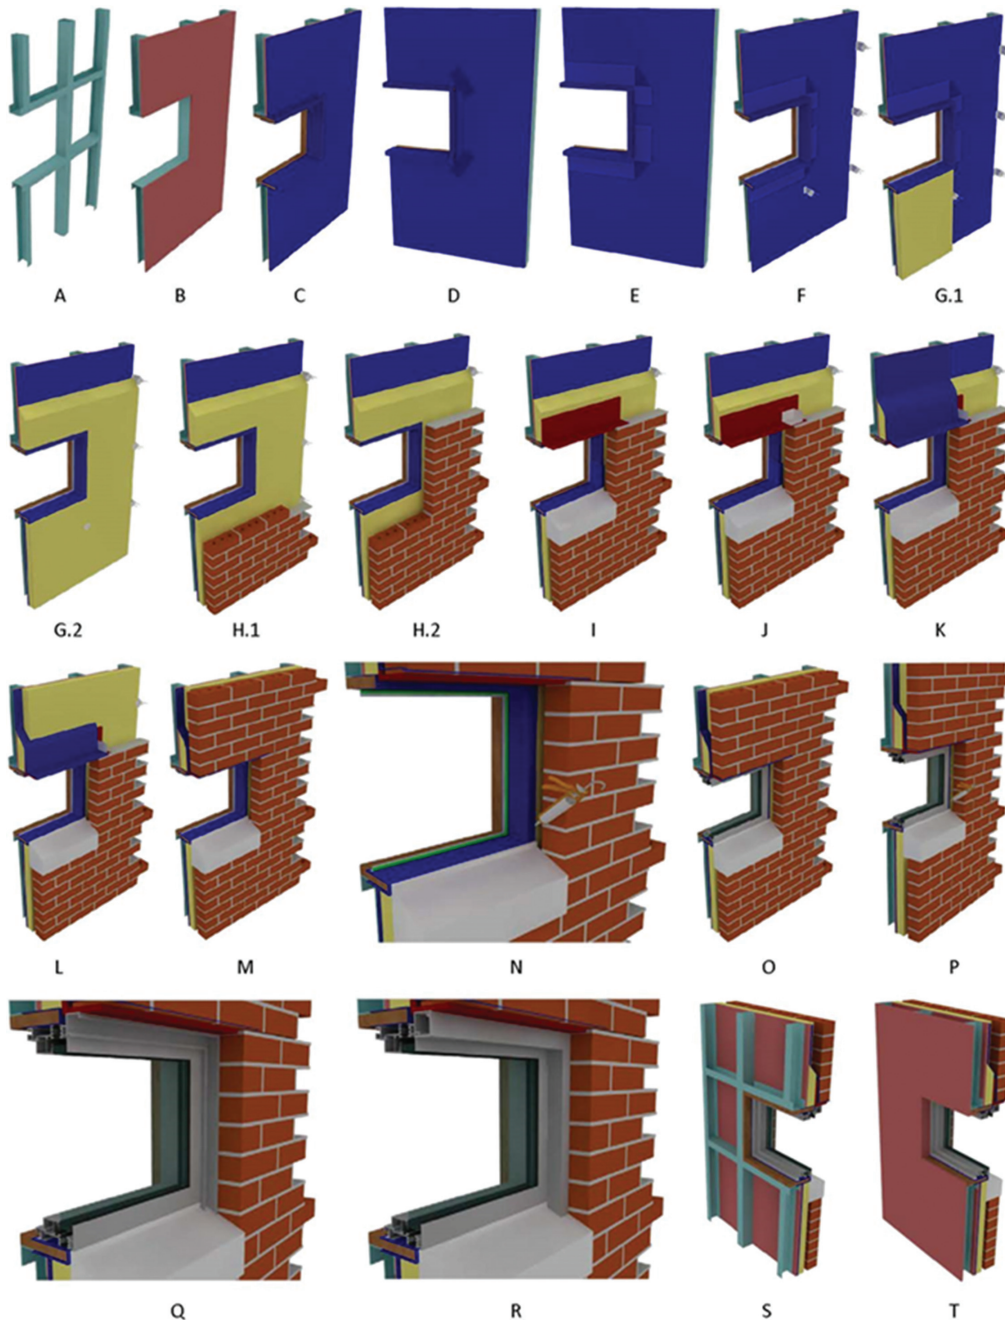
Window installation in steel stud wall with exterior insulation and brick façade.
